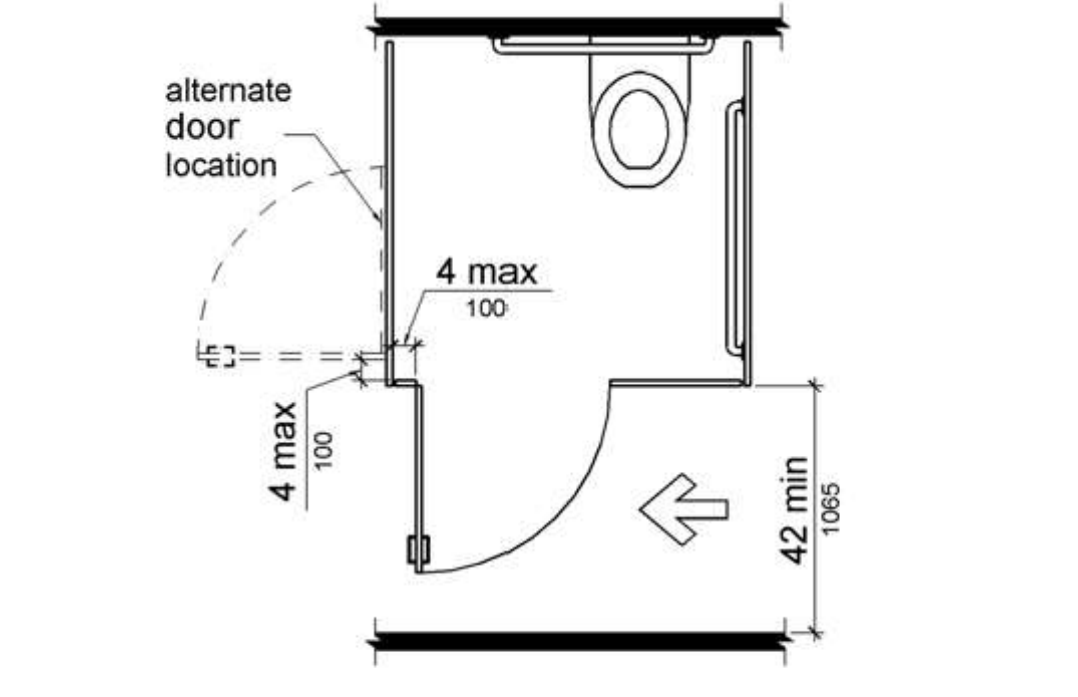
Wheelchair Accessible Toilet Compartment Doors
